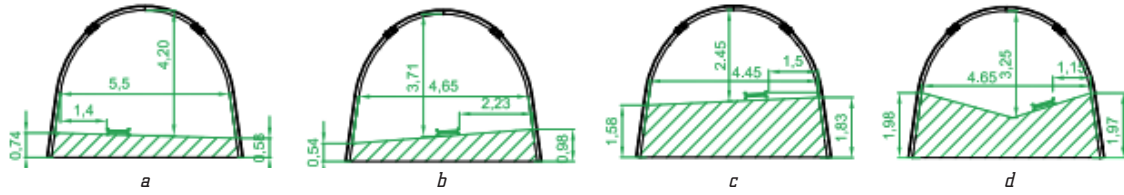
Roadway floor swelling in hard rocks: a – St 0; b – St 1; c – St 2; d – St 2+4.0
